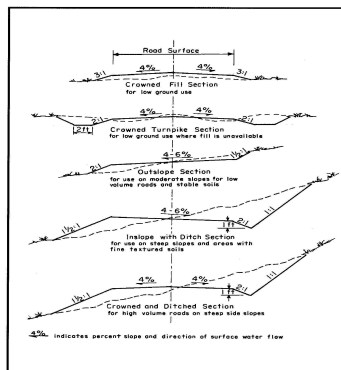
The choice of cross-section for a road or section of a road depends on drainage needs, soil stability, slope, and expected traffic volume. Dashed lines indicate natural land contours, and solid lines indicate constructed road. (Redrawn and adapted from Michigan Department of Natural Resources 1994, p. 23)
